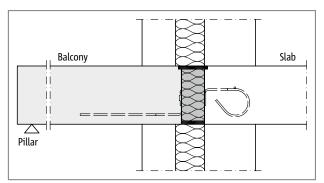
Schöck Isokorb® T type Z, Q: Indirect support, non-load-bearing cavity masonry
